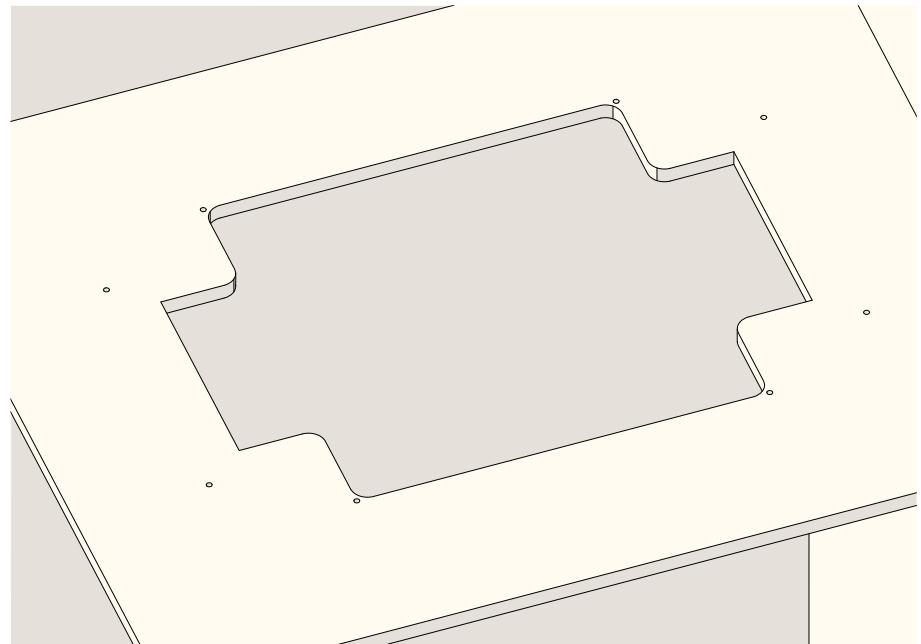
PLATE AND SHOWER FIXING – BEFESTIGUNG VON PLATTE UND DUSCHE – FIXATION PLAQUE ET DOUCHE – FIJACIÓN PLACA Y DUCHA
